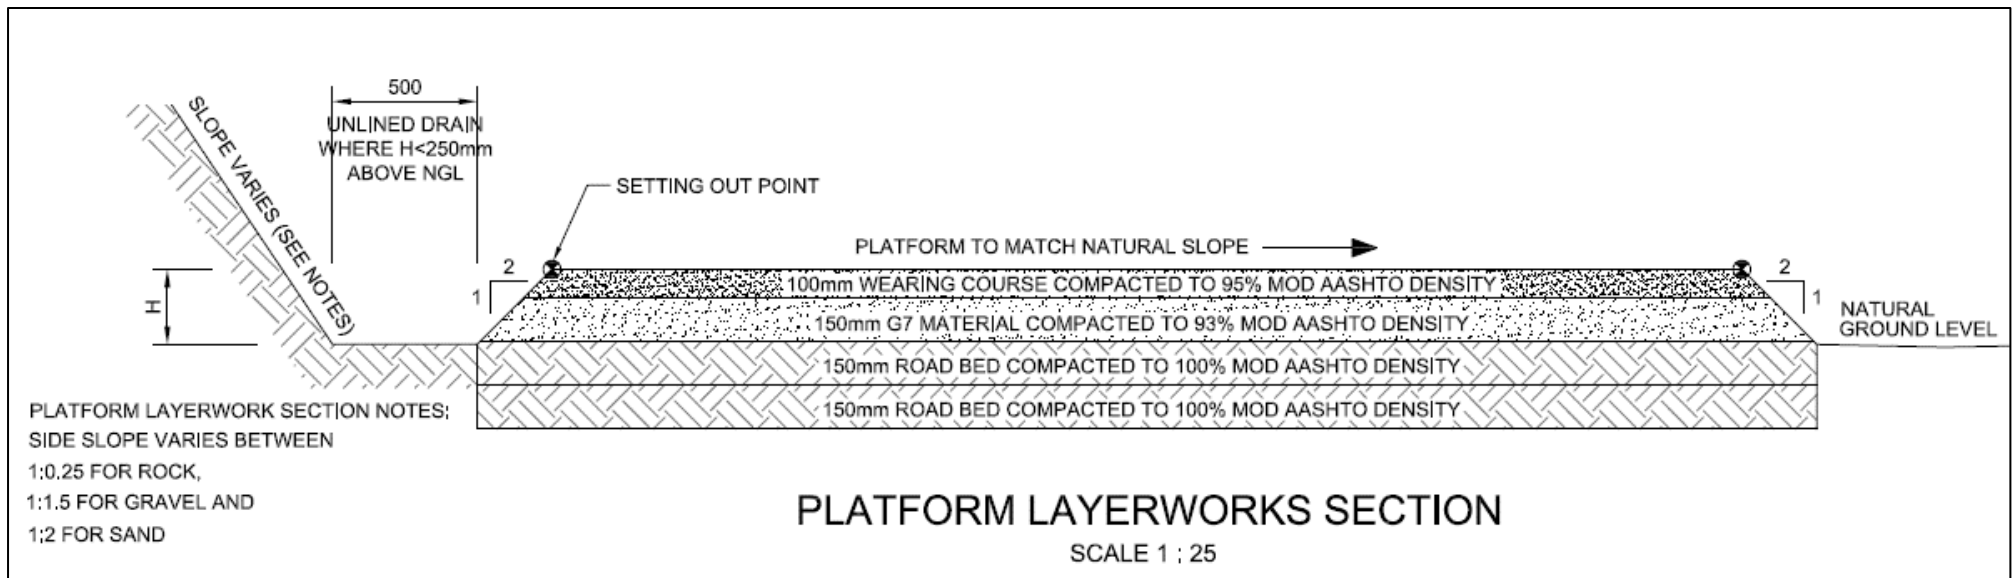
Rig platform drilling site engineering design example (Source: Preliminary Drawings by Burmeister & Partners for REN, 2022).
